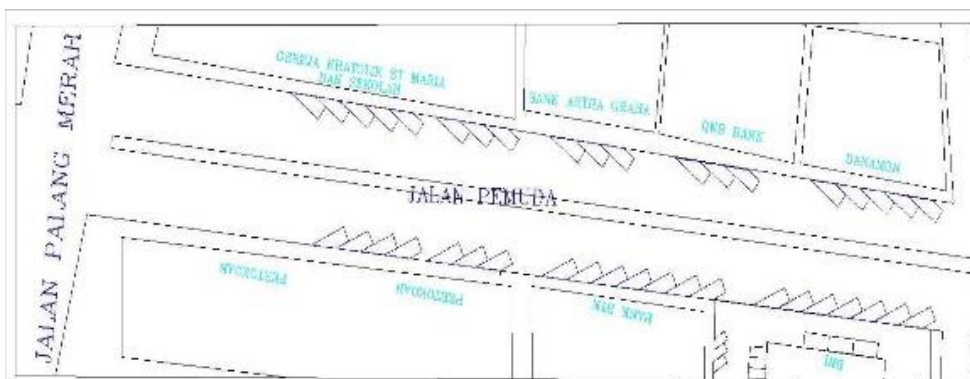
Alternative parking arrangement 4 Section B corner 30°
